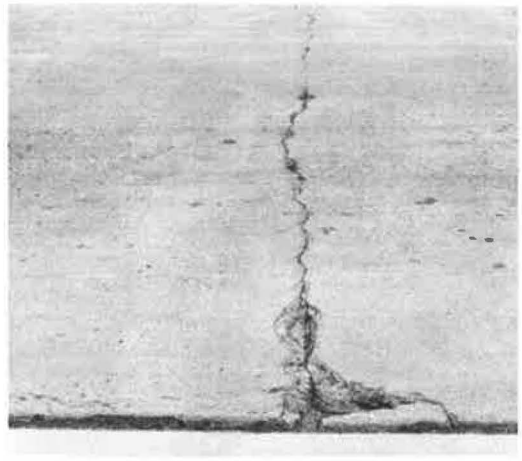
Slab II—distress at longitudinal edge crack, mid-length of slab; transverse crack open  $\frac{1}{8}$  in., August 1965.
